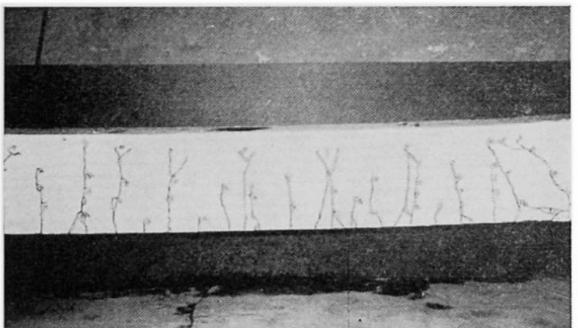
Same beam as in Fig. 8, but with the bent plate joint. Compare with beam 3.
